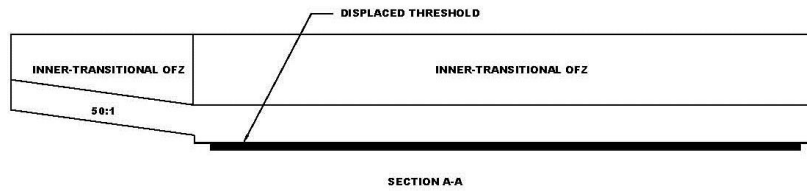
CROSS SECTION OF OBSTACLE FREE ZONE
